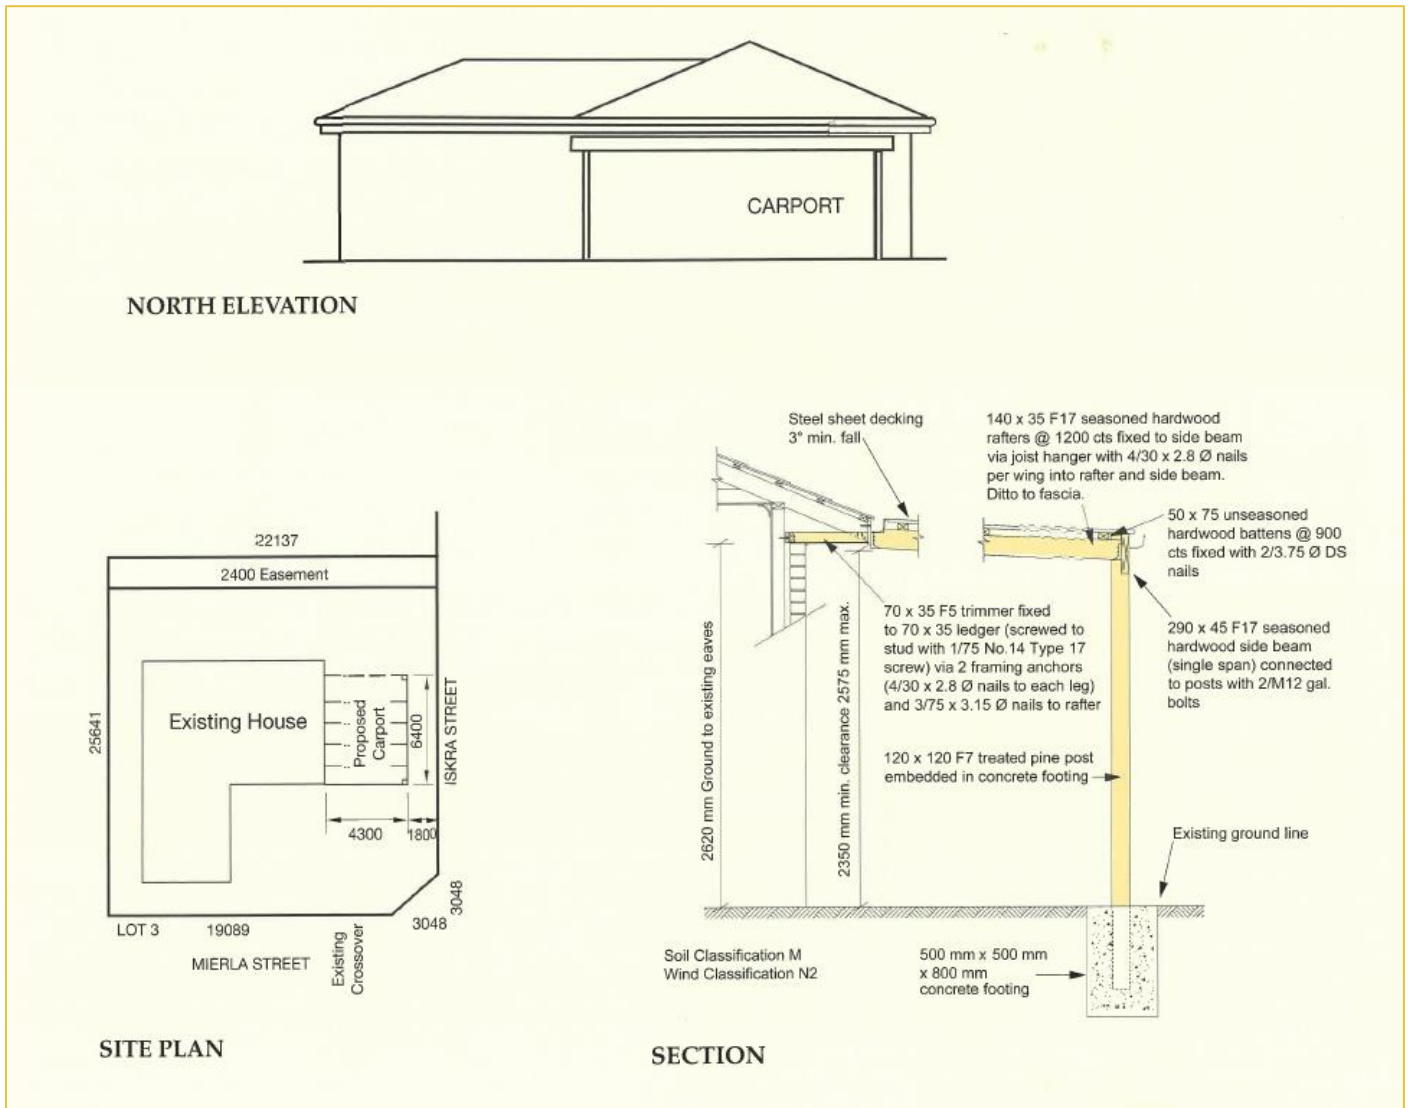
Example of Section View, Footing Detail, Elevation and Site Plan
